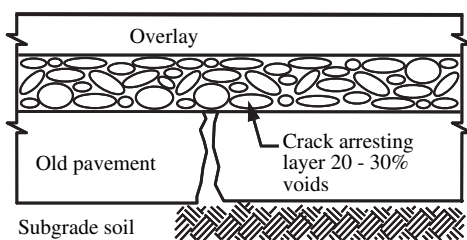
Cross section of a typical crack-arresting interlayer.
